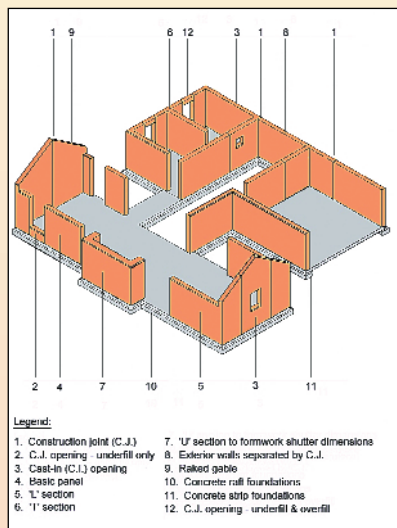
An isometric view showing the configuration of typical SRE wall elements in a building produced using the Stabilform™ system (© Affiliated Stabilised Earth Group)
